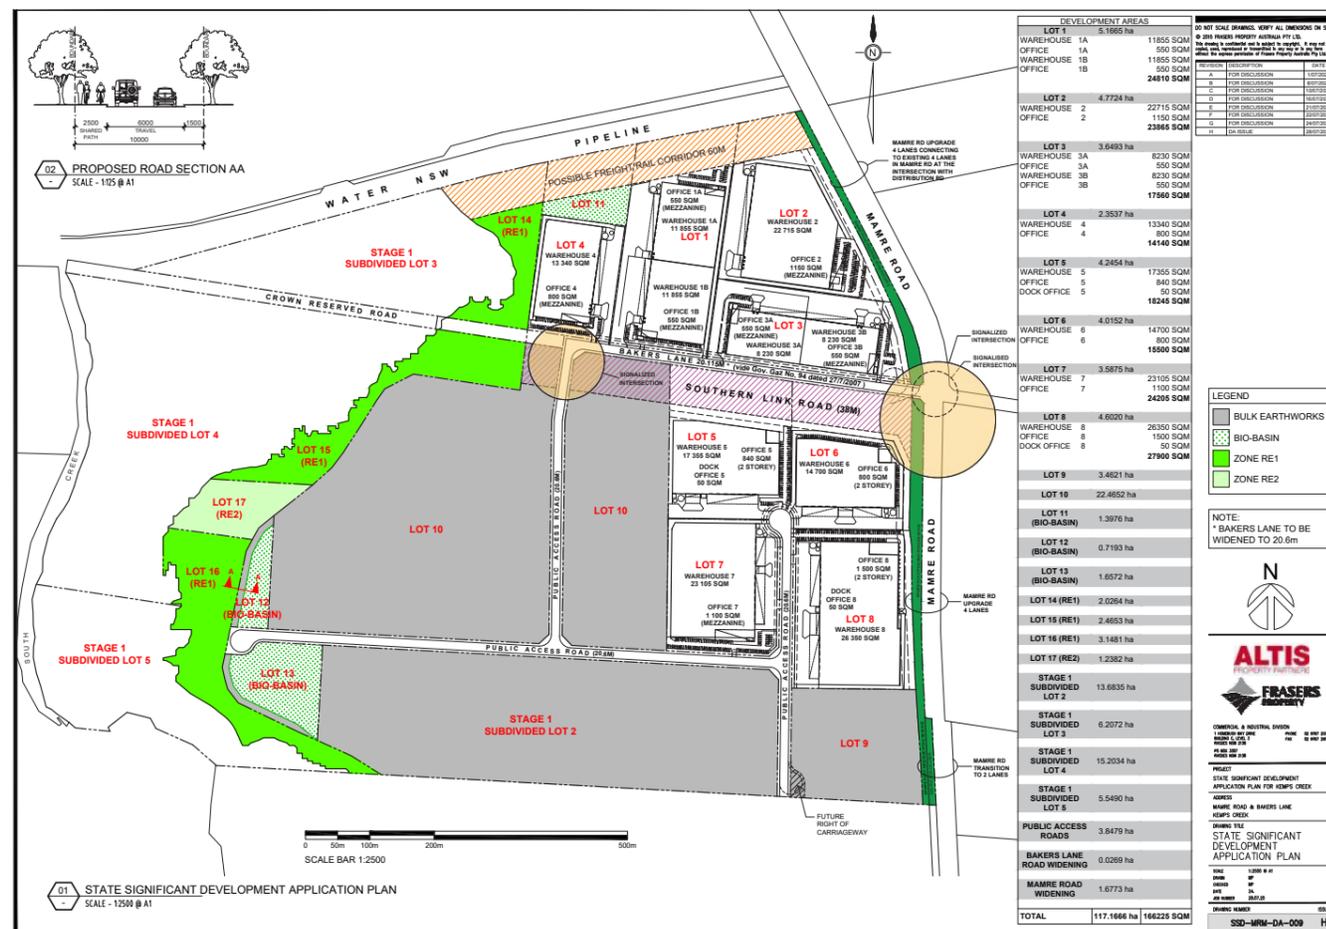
Kemps Creek Industrial Facility - SSD Plan (Source: Frasers & Altis)
